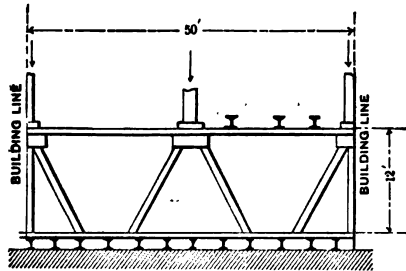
Plan Employed in Western Union Building for Distributing the Weight to the Foundations.
